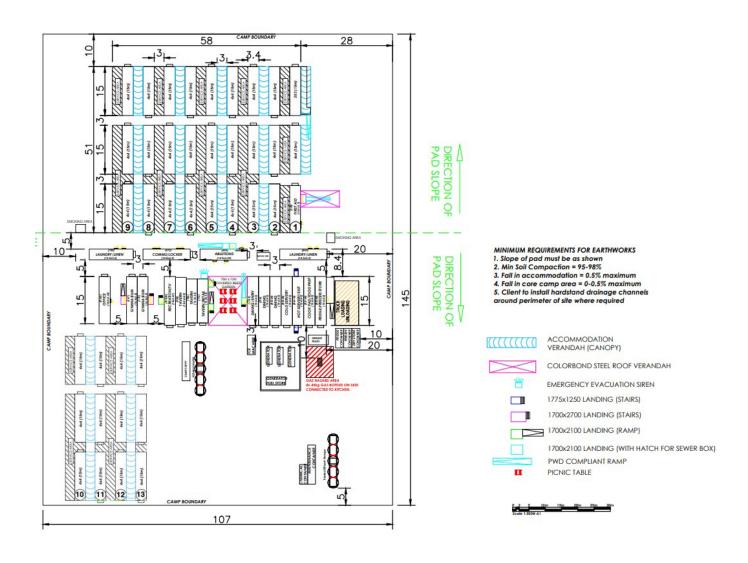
Example of a typical temporary worker's accommodation camp layout
